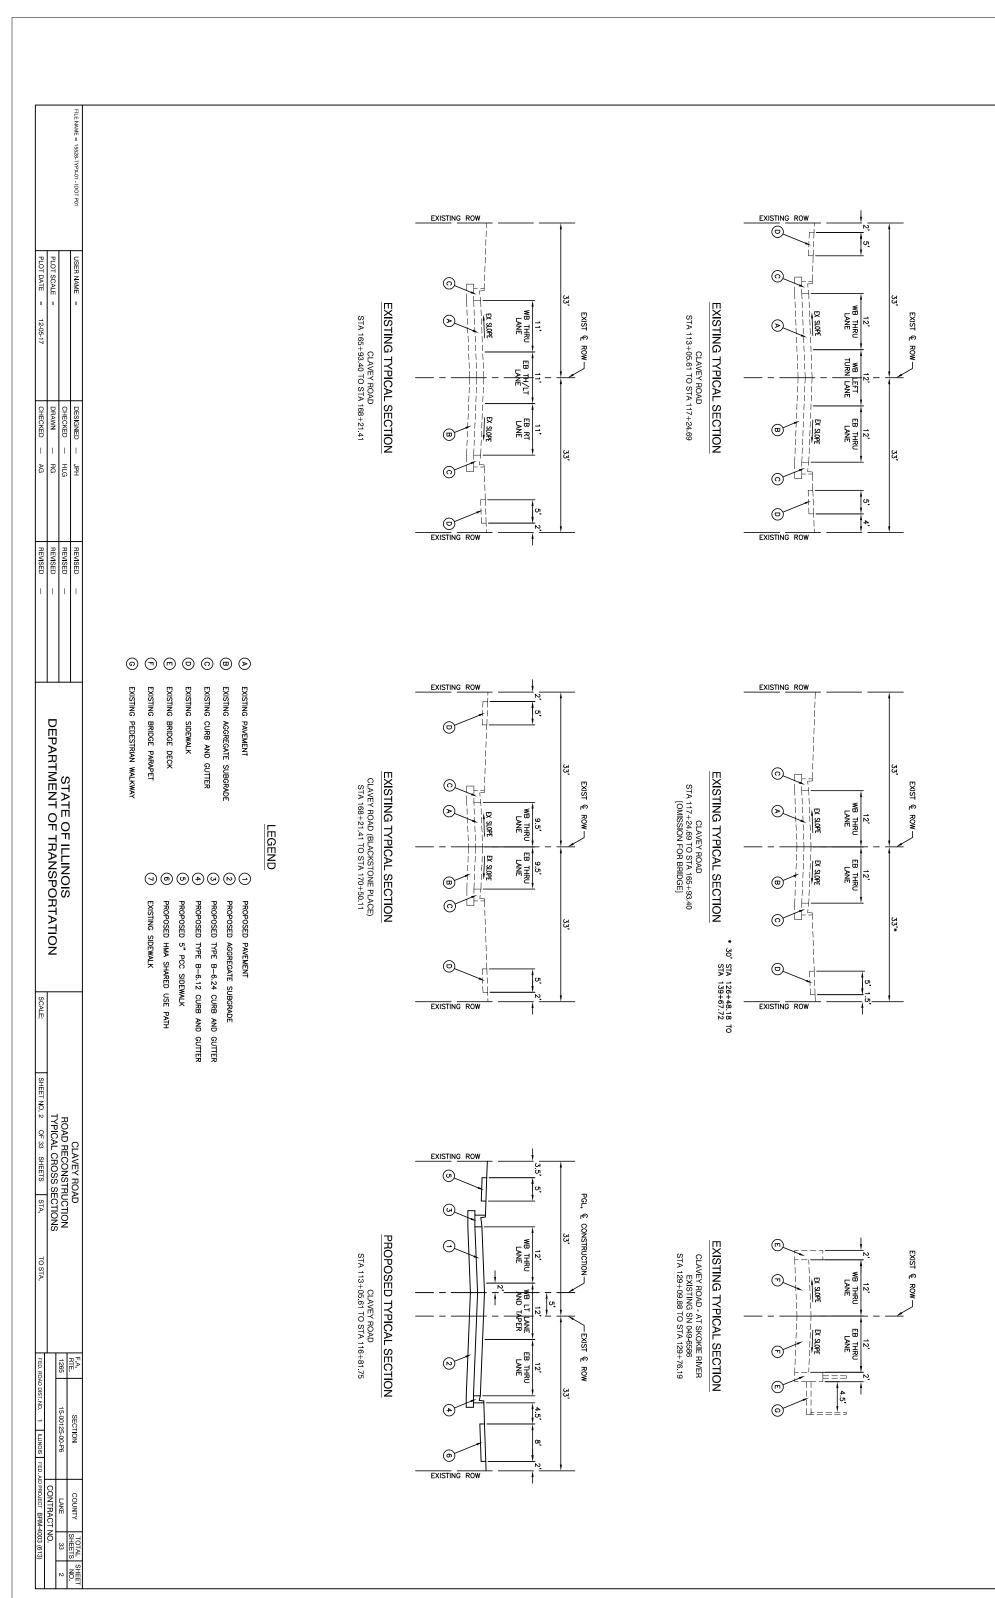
EXISTING AND PROPOSED TYPICAL SECTIONS
